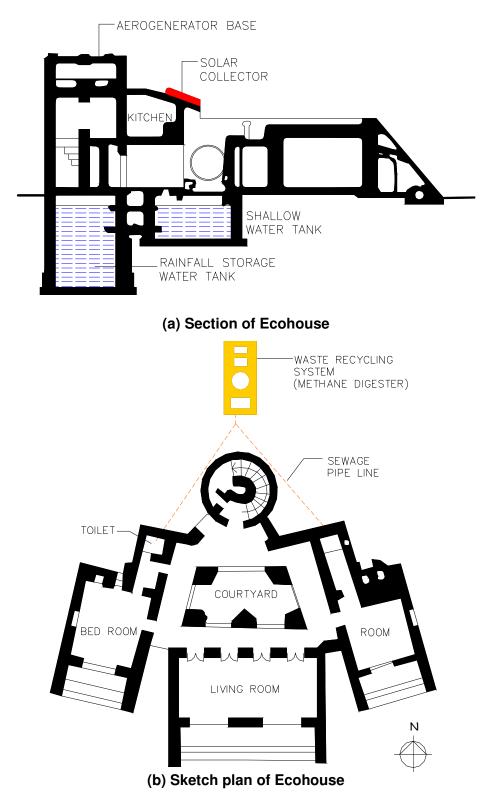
Section and sketch plan of Ecohouse, Auroville
